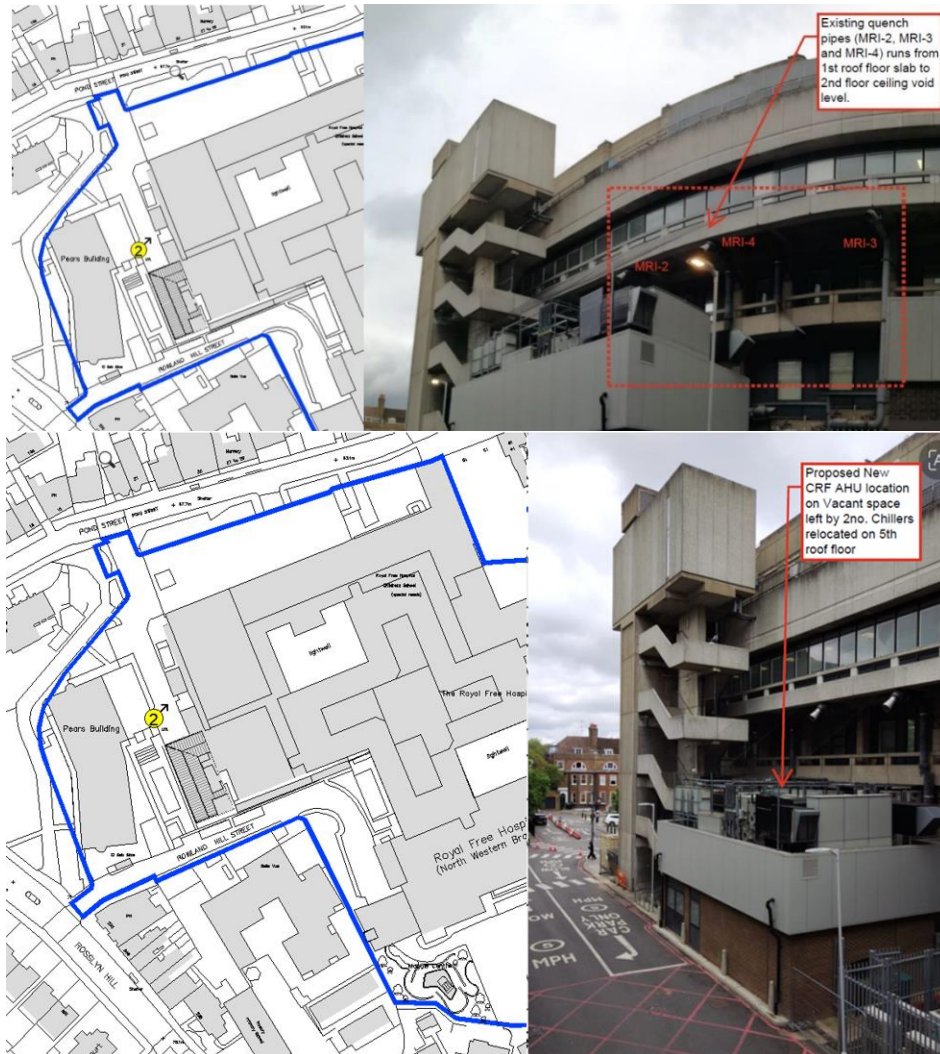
Existing quench pipes to be re-routed & Proposed location for New CRF AHU
